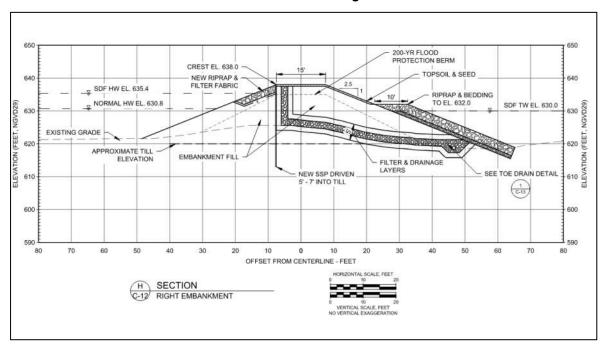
Cross Section View Sanford Dam Right Embankment Reconstruction
